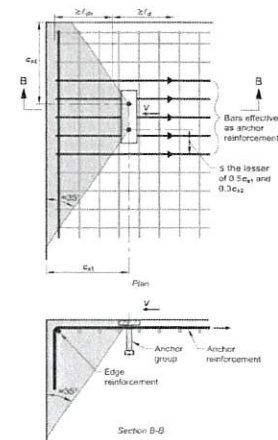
(b) - Edge reinforcement and anchor reinforcement for shear.
